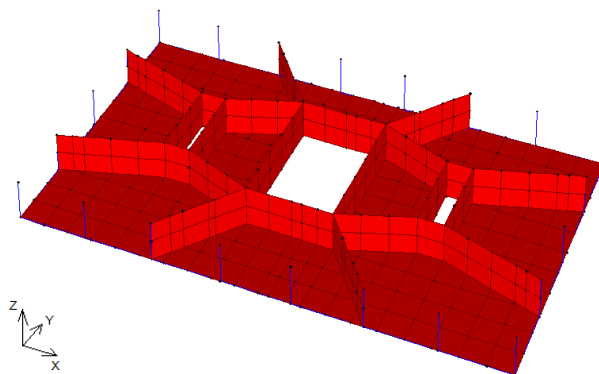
Disposition of the walls that form an outrigger at a certain floor
